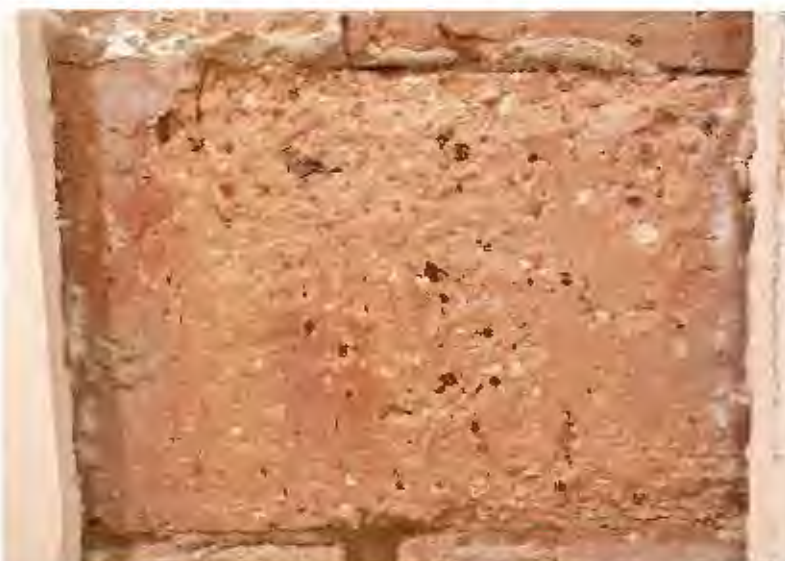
Opening 1a in Unit 1, which is on a short return at right angles to opening 1. This 2002 brick is decaying due to salt attack, the salt and dampness coming from the adjacent sandstone. Bubbling of the plasterboard extends almost to the ceiling, indicating that salts may be found in the next level above.
